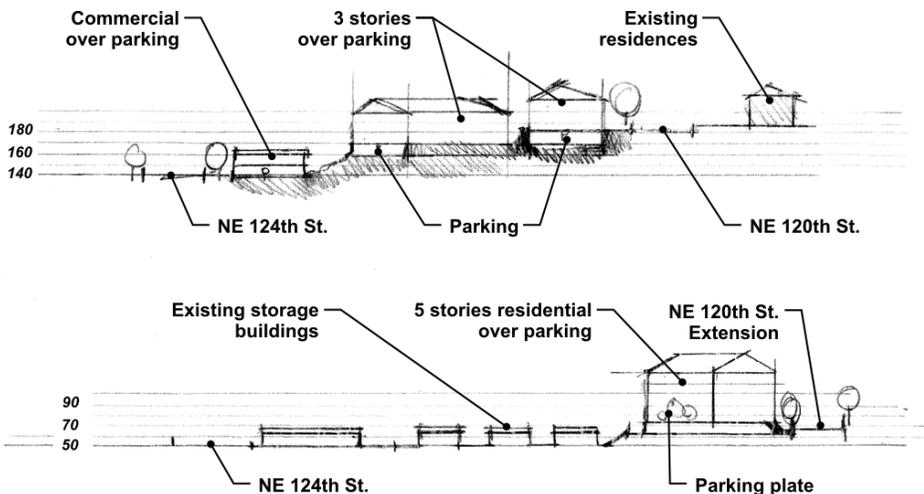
Redevelopment concept incorporating multi-family uses along Slater Avenue NE and planned NE 120th Avenue extension. Note how residential buildings are configured towards the street and around common open spaces. The section drawings above illustrate how development can take advantage of slopes.
